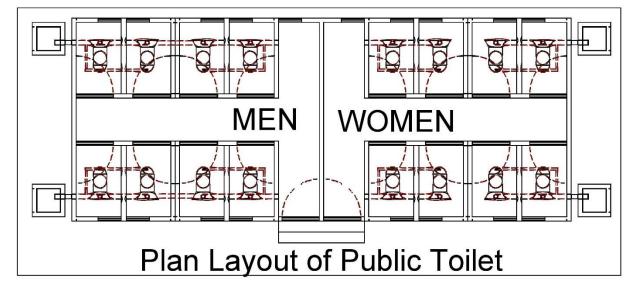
Plan of Public Toilet by Using AutoCAD
